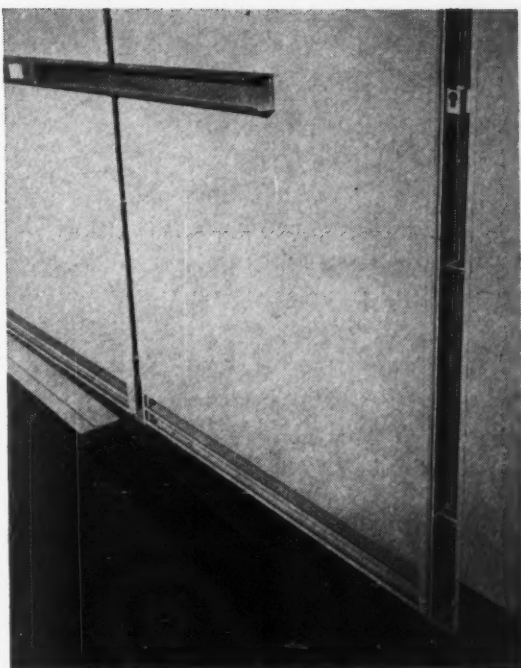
Use of keyhole fitting to support horizontal wire-way
